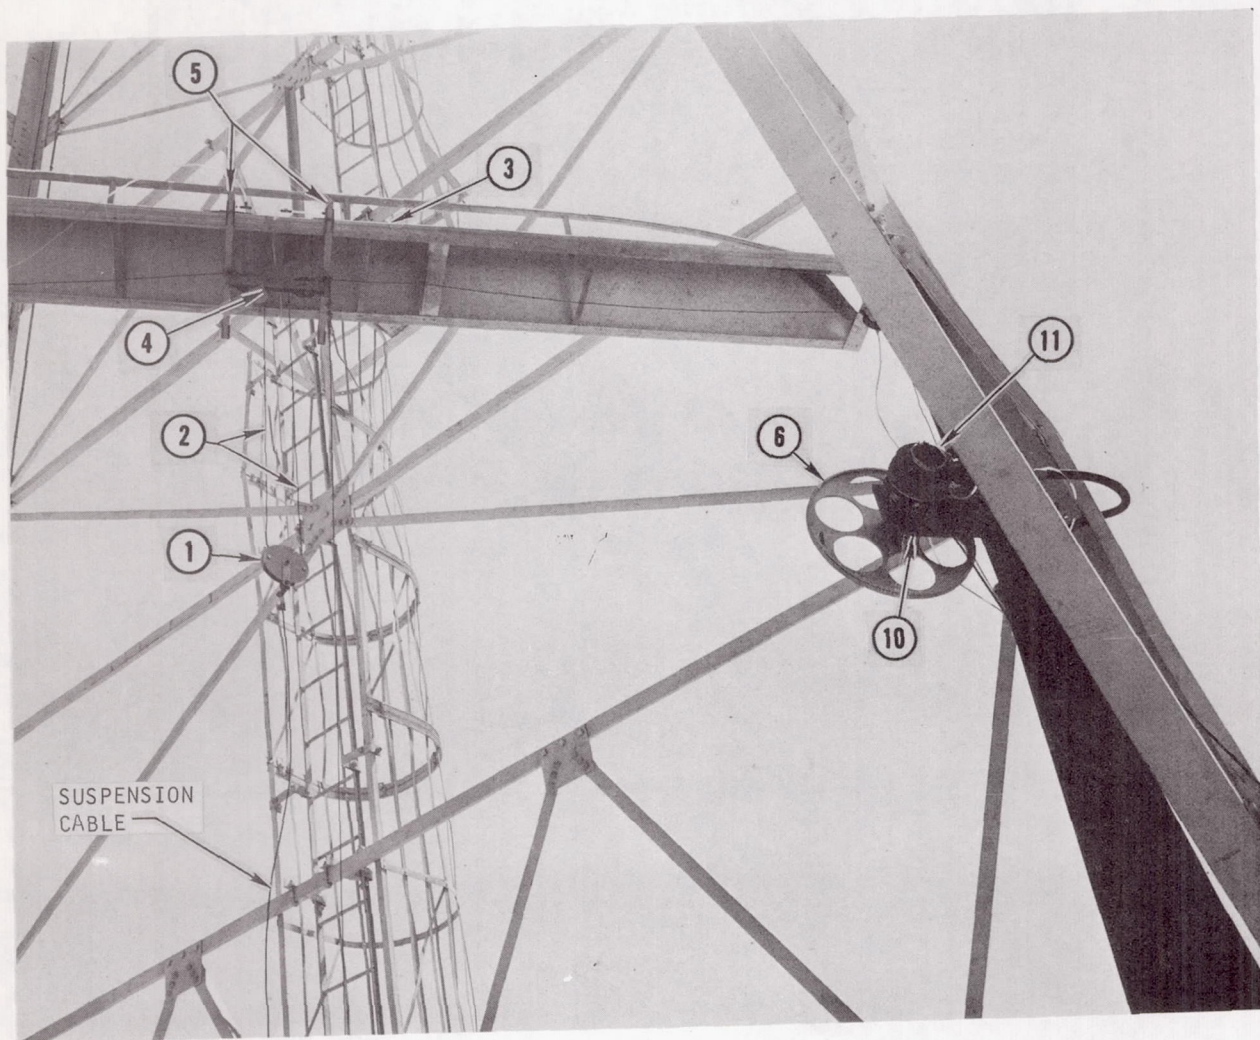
Yoke and Cable Assembly with Air Turbine
